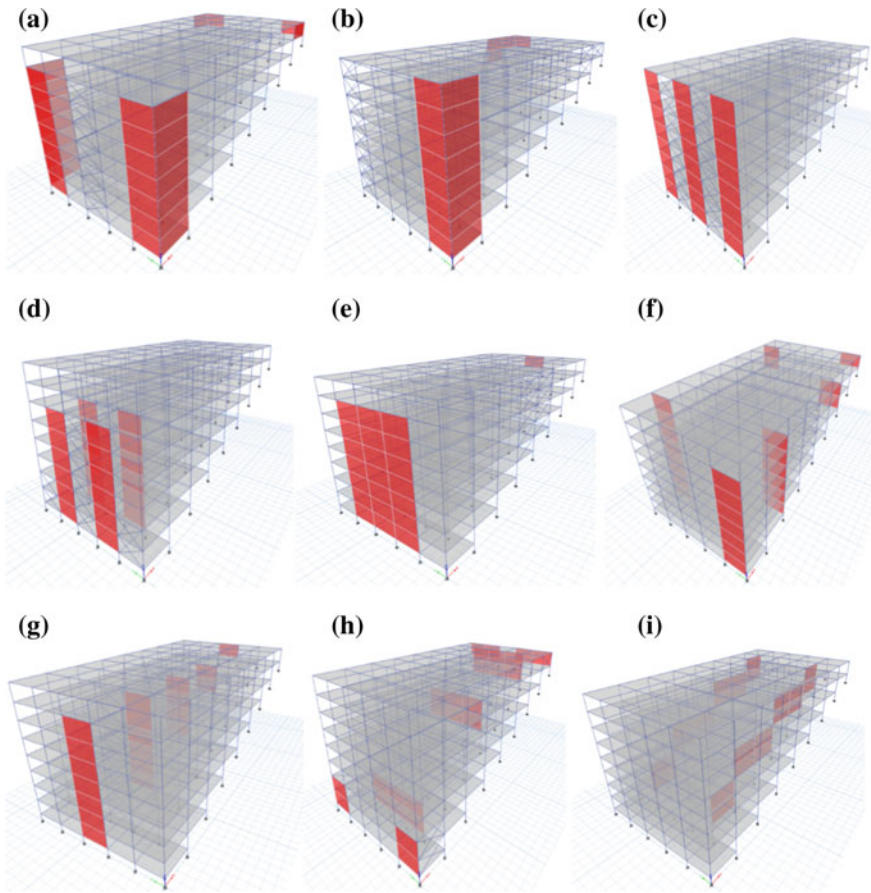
Combined bracings and shear wall configurations created on step back buildings
